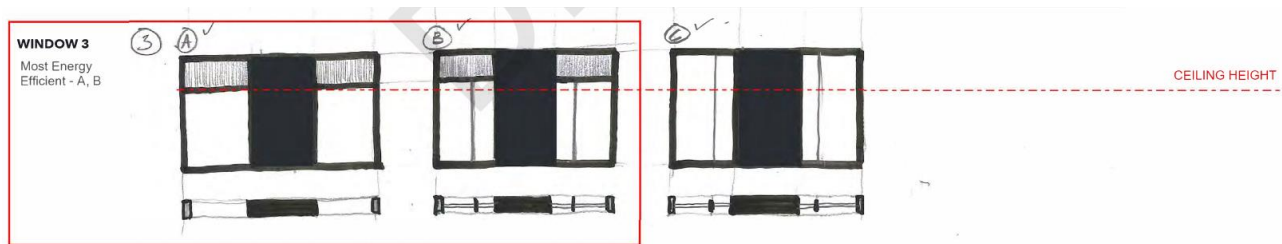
Architect drawing detailing window specifications with respect to building ceiling height.
